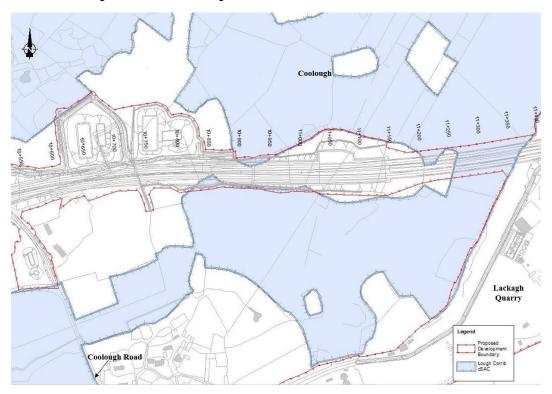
Proposed Road Development Ch. 10+620 to Ch. 11+420
